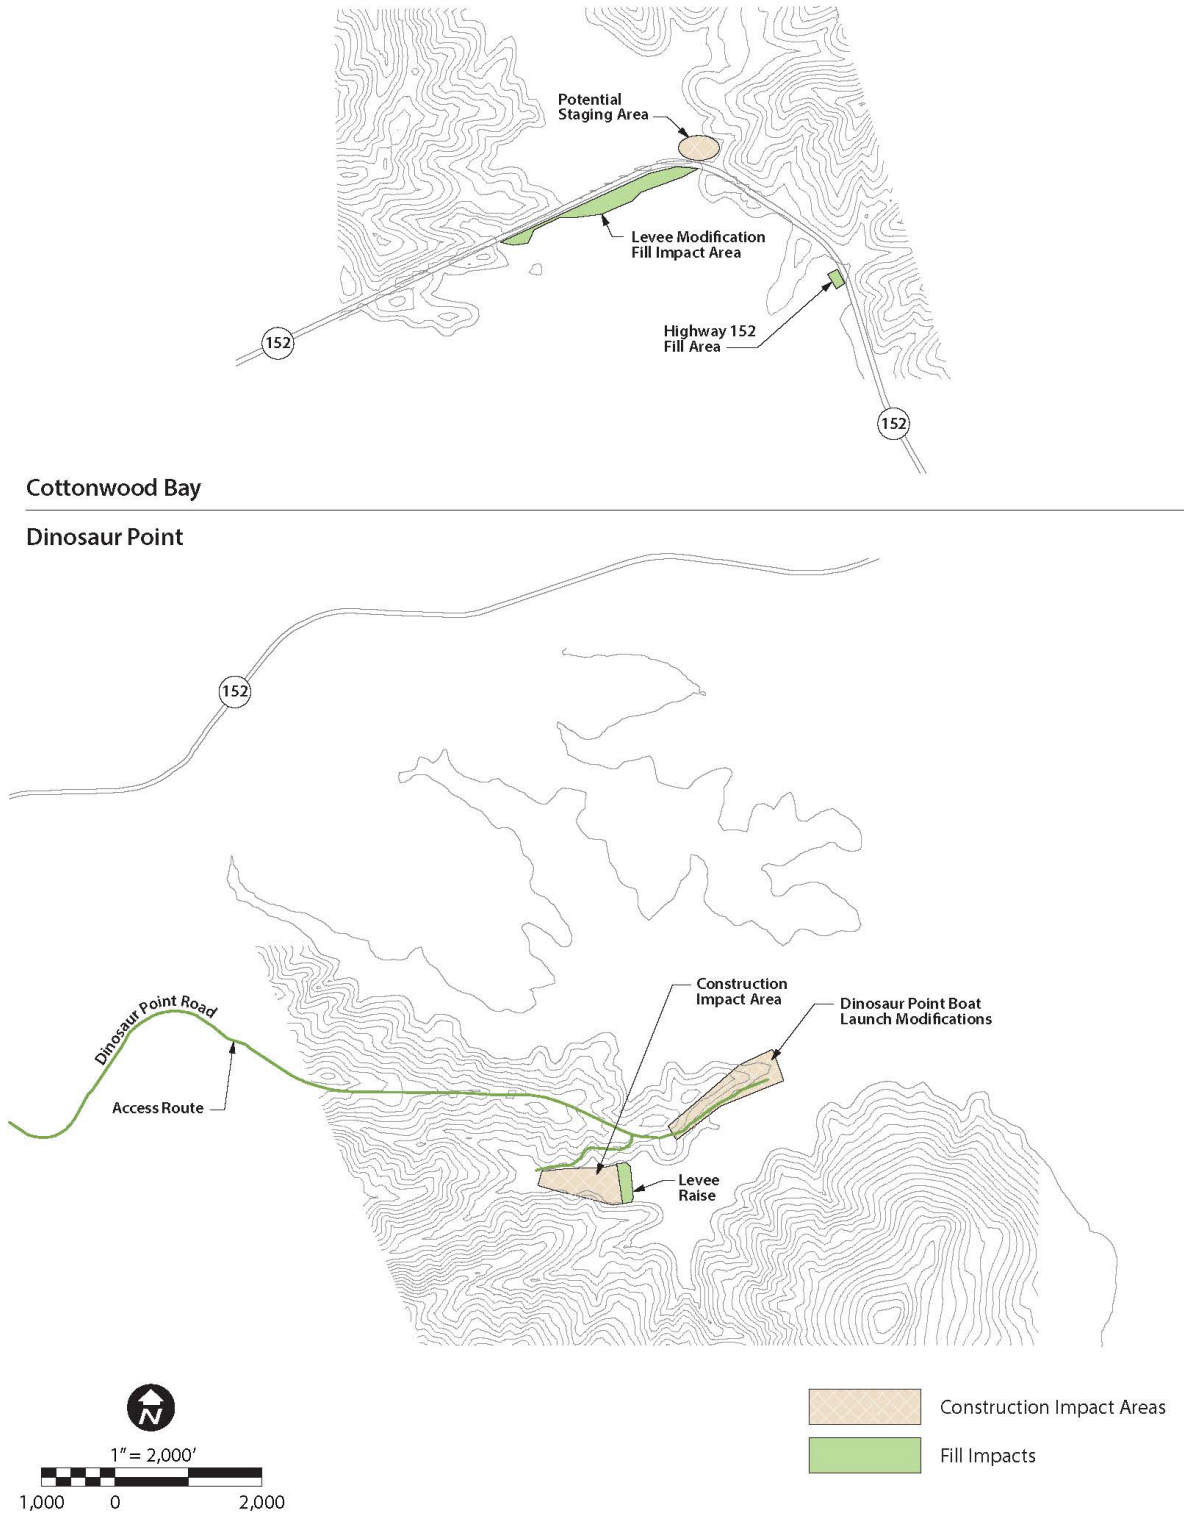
State Route 152 and Dinosaur Point Facilities and Construction Areas
